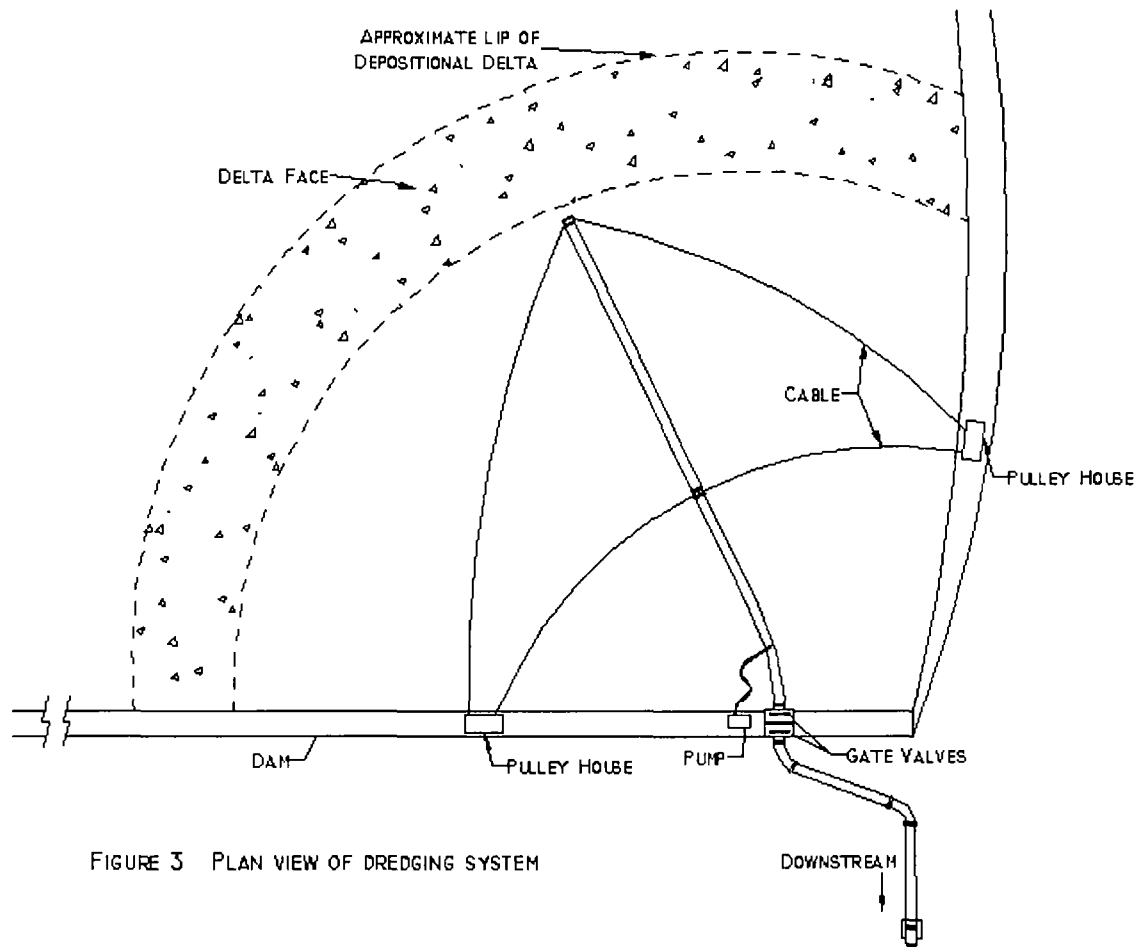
PLAN VIEW OF DREDGING SYSTEM
